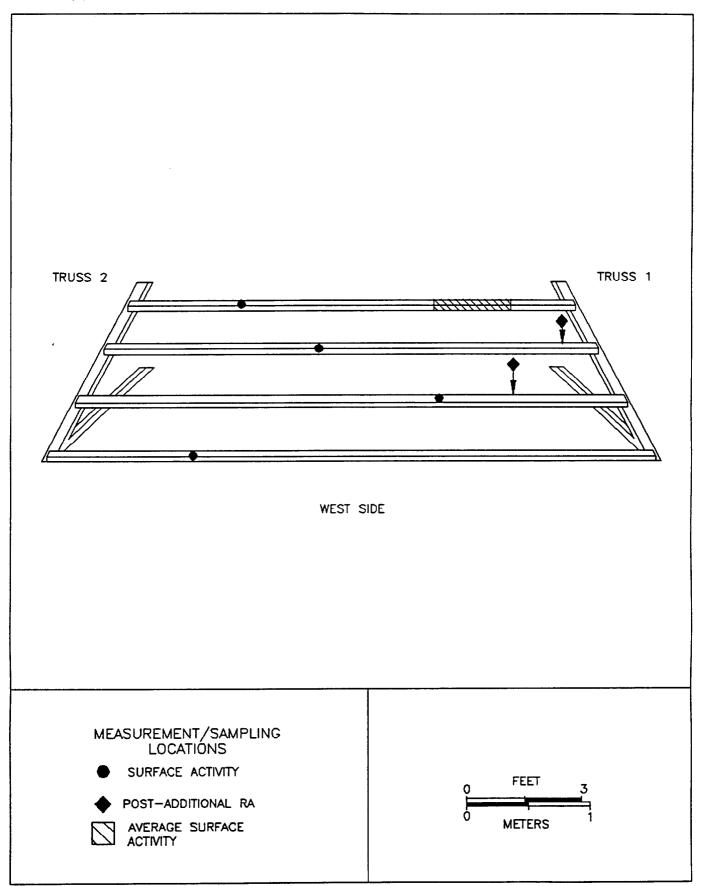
Building 8, Mezzanine, Bay 1 — Measurement and Sampling Locations
